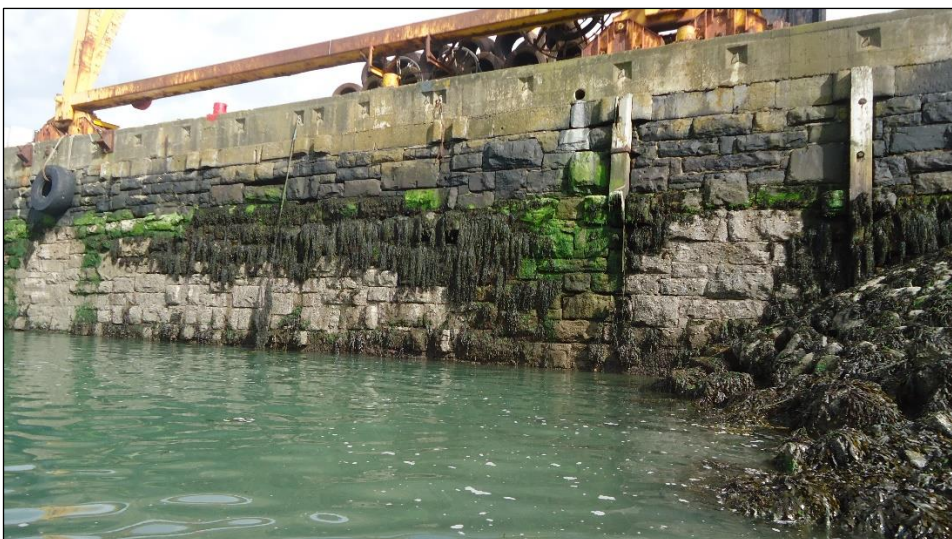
View from Berth 1 looking south along the façade of Berth 2.
